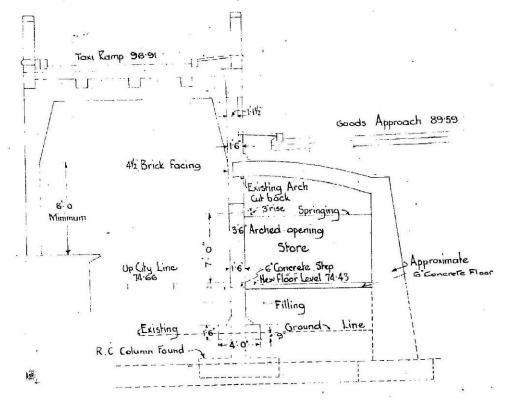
Showing alterations to Vault 8 and its small scale (source: G.W.R Paddington Station Improvements: Bishops Road Station, Goods and Taxi Approach Roads, Foundation Plan and Sections, Contract No.11, Drawing No. 7)
